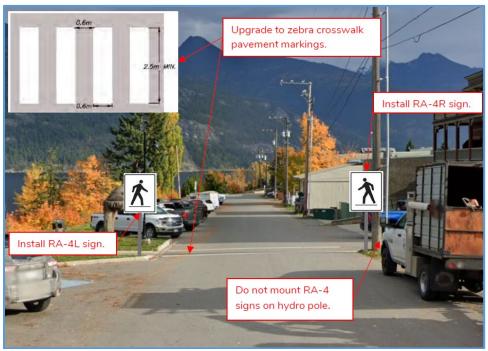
Recommended Crosswalk Signage and Pavement Markings on Water Street
